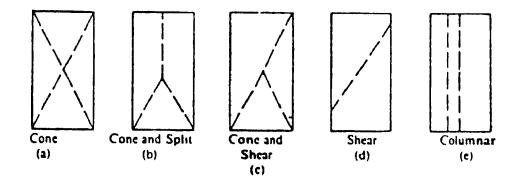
TYPES OF FRACTURE OF CONCRETE CYLINDERS'
